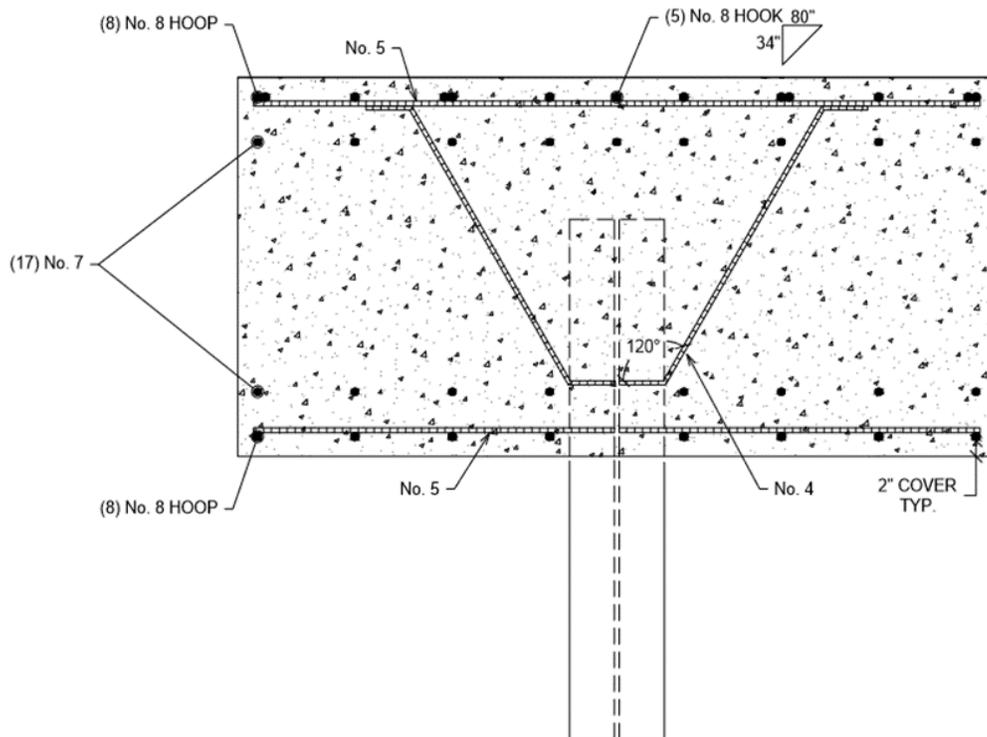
Plan view of UHPC joint specimen showing locations of connection bars
